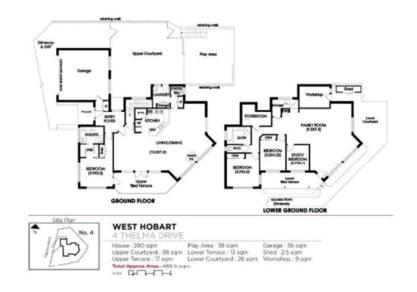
Site and floor plan for the change of use (Applicant plans, taken from www.realestate.com.au, 2022)
